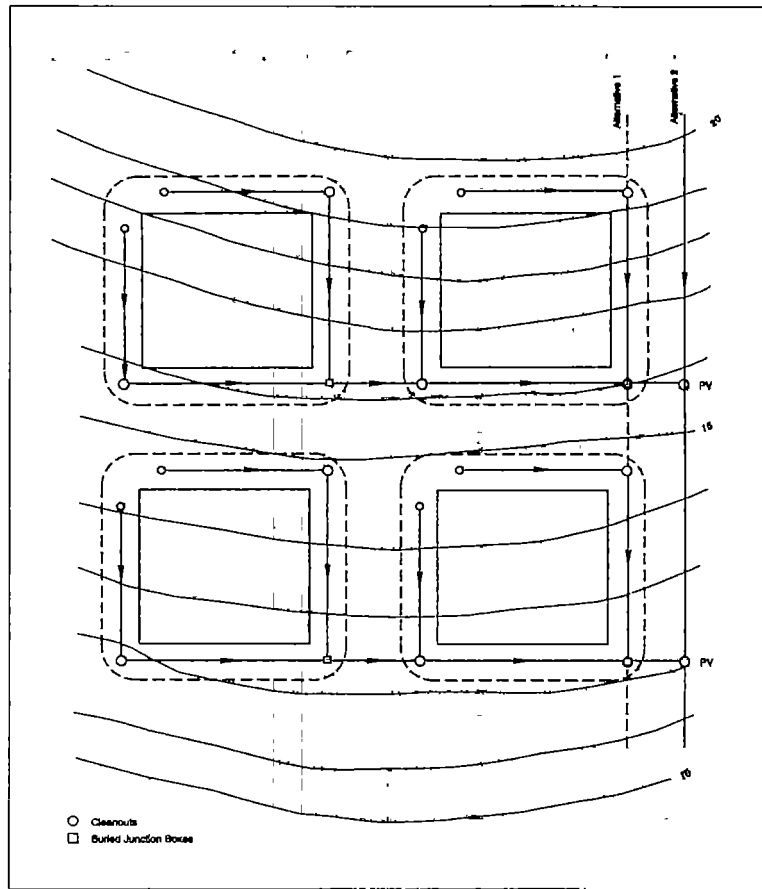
Typical layout of simplified sewer system (SABESP)
